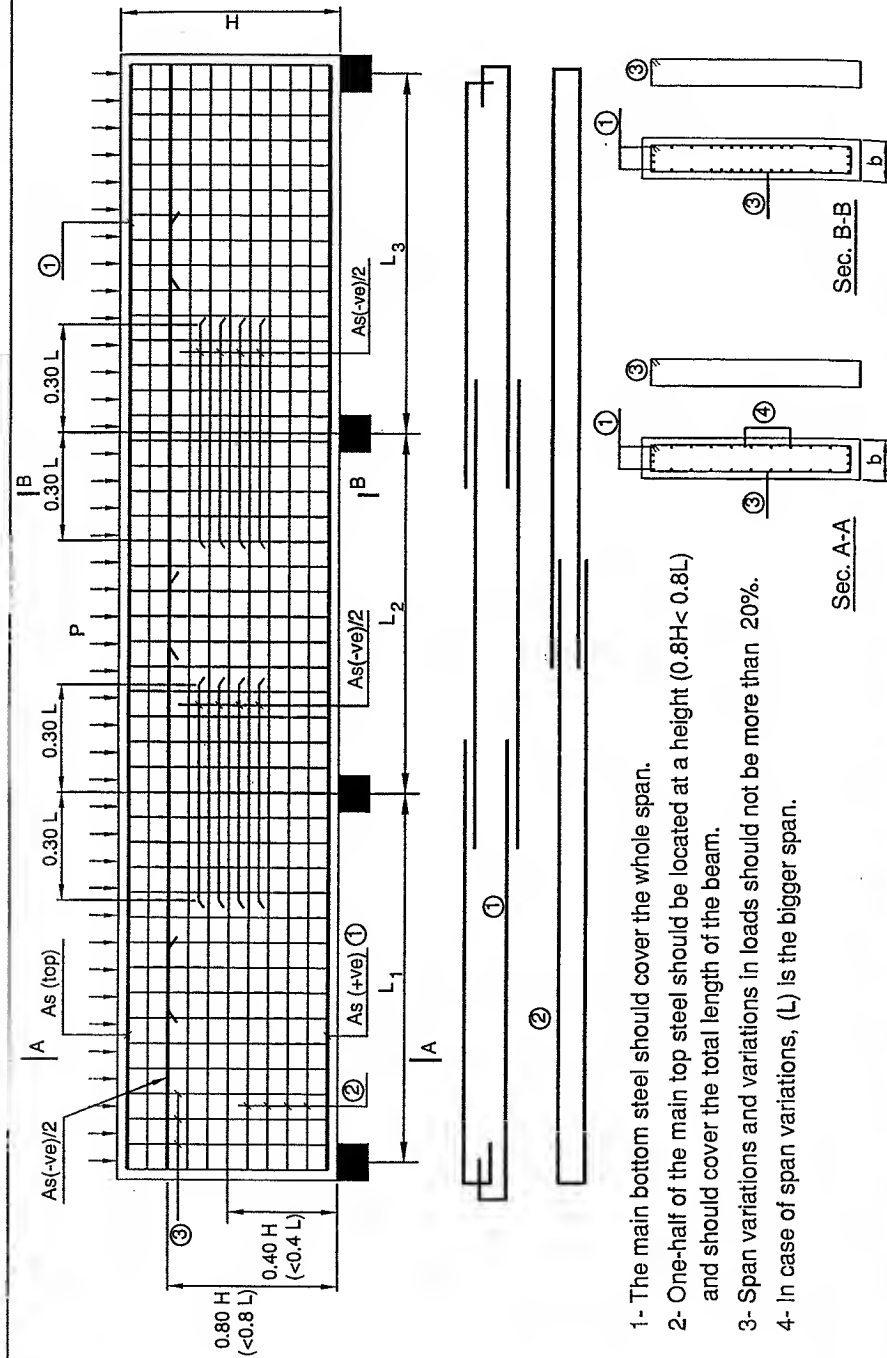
Reinforcement of a top-loaded continuous deep beam
